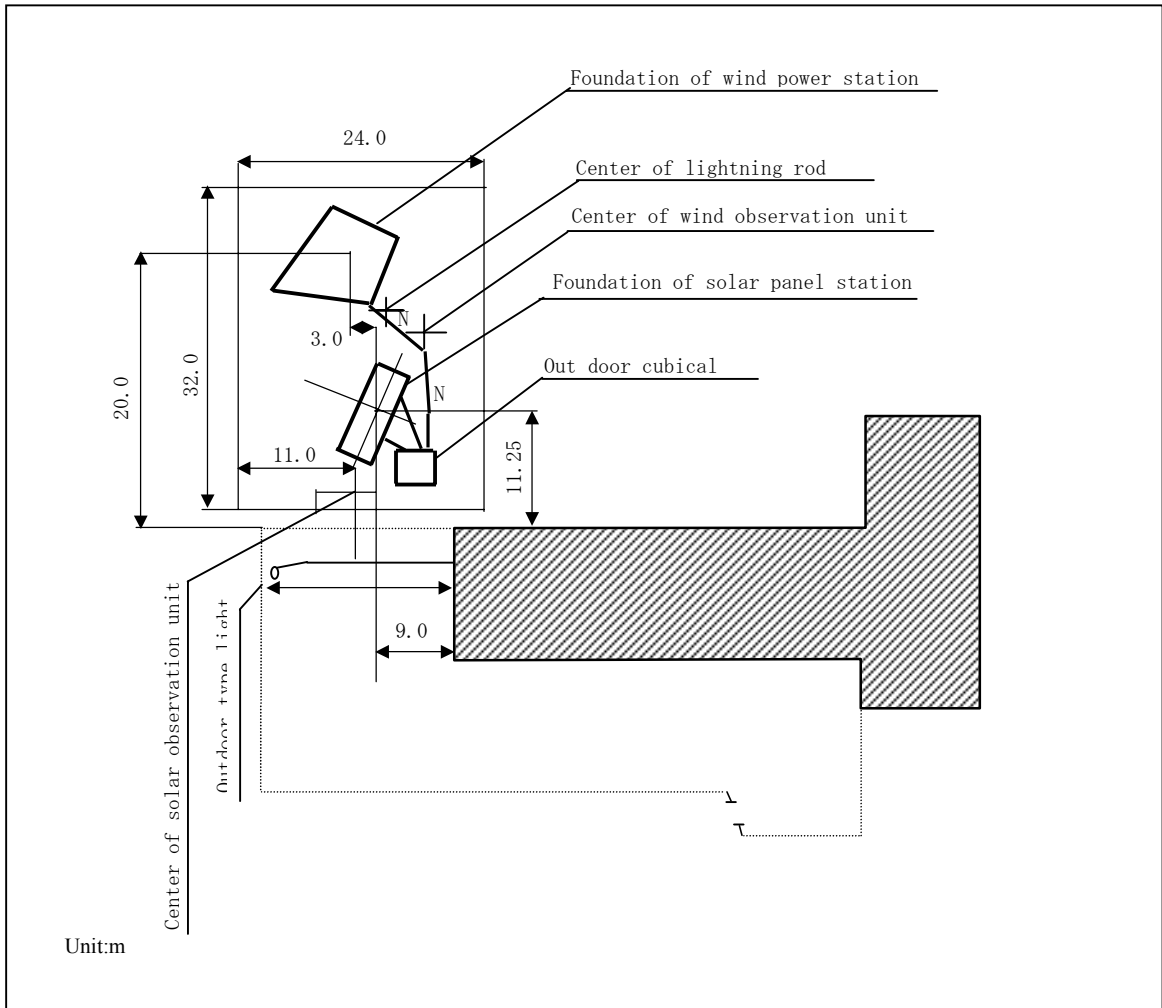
Plot Plan of Pilot Plant (Adaatsag)
